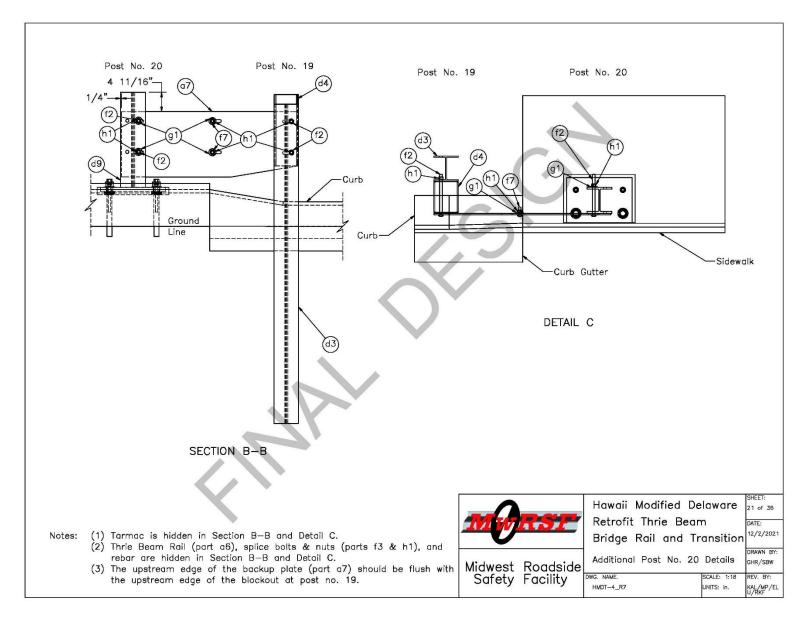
Additional Post No. 20 Details, Test No. HMDT-4
